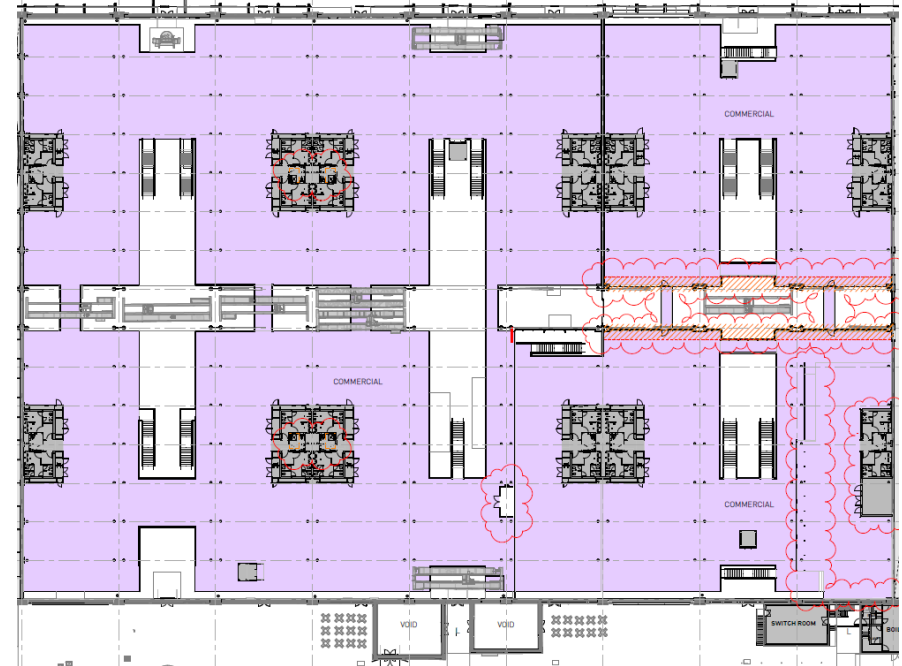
Proposed First Floor Plan (Source: Sissons, 2020)
